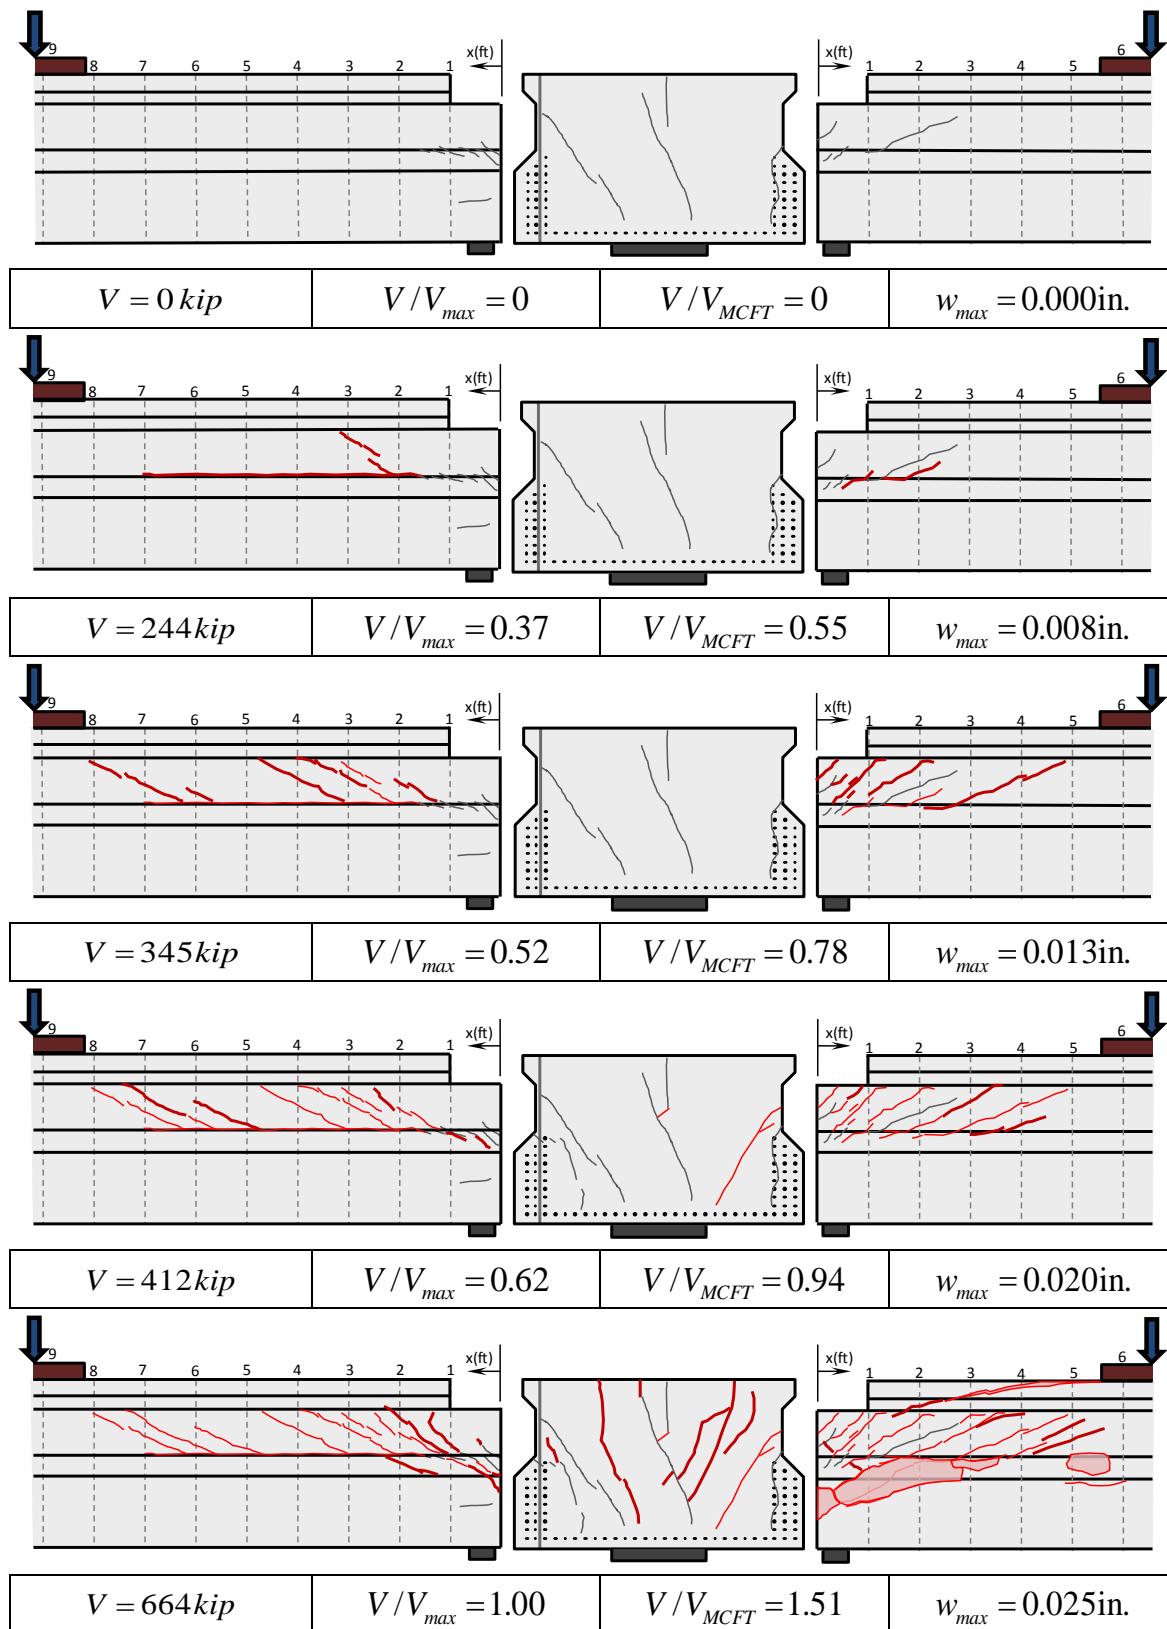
Crack Maps for 5B40-3 Skewed End Shear Test
